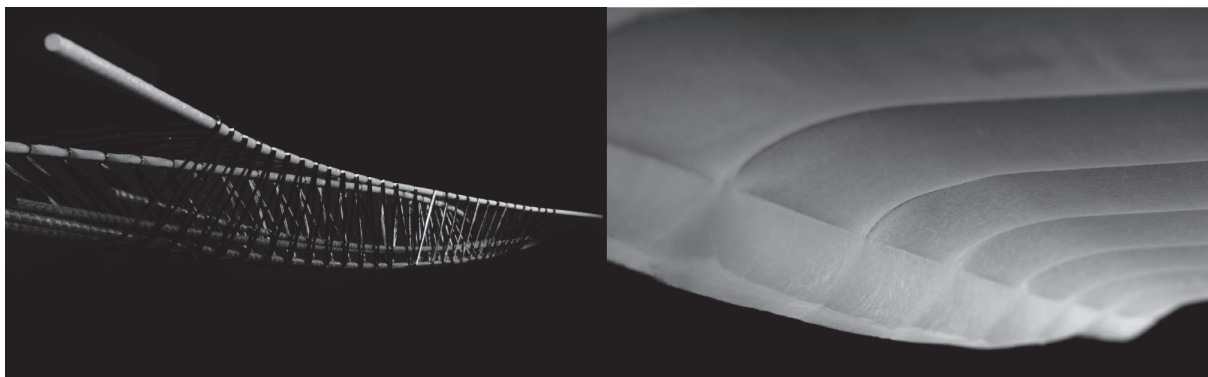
Left: Internal reinforcement for optimised concrete structure [32];
